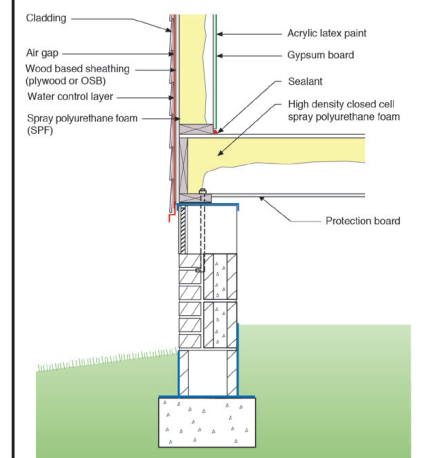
A protection board such as fibercement should be installed to prevent animals from getting into the floor assembly.
